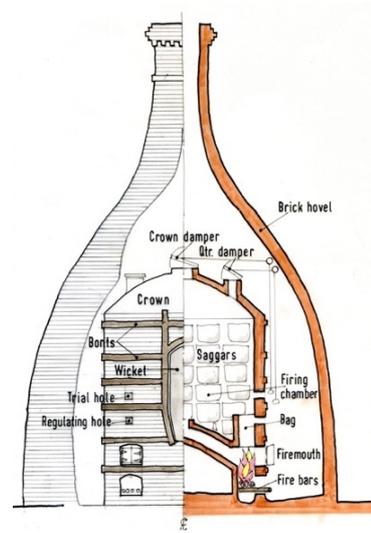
Cut-away drawing of an updraught bottle oven
